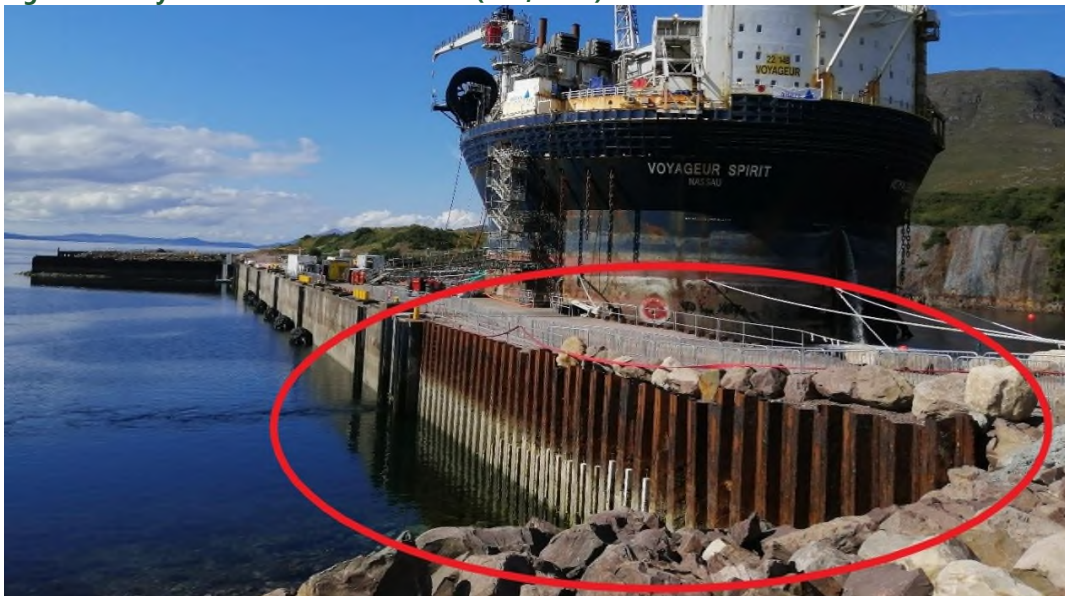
Area of Refacing Works Required. Photo shows the Easterly Abutment. (KPL, 2024)
